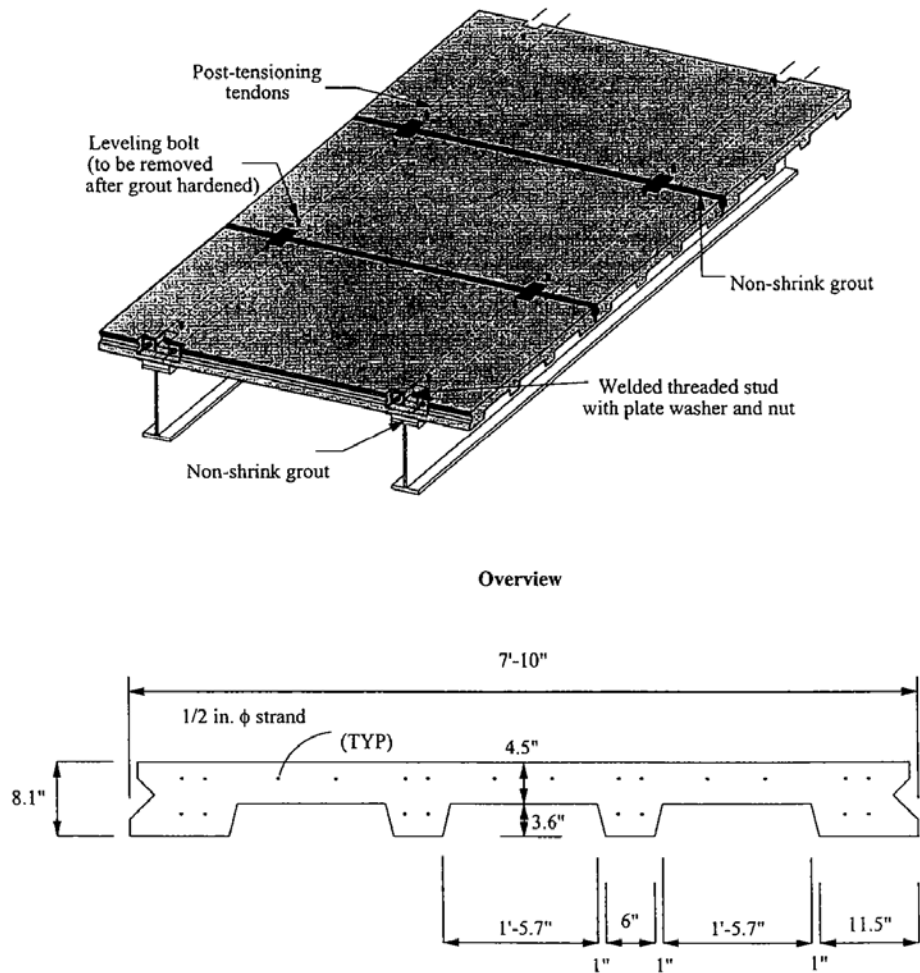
Full-depth Precast Prestressed Concrete Bridge Deck System
